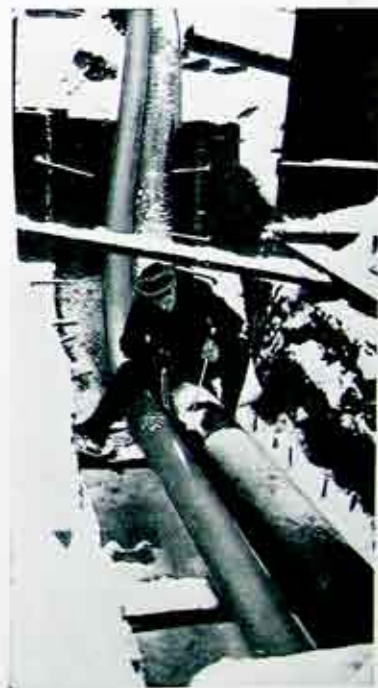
Welding the 10-in. steam main which crosses Mill Street
